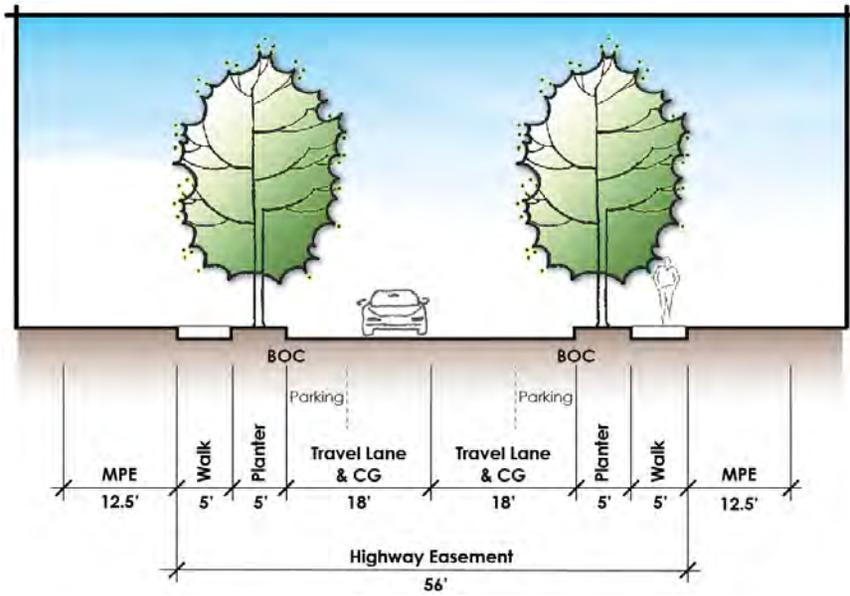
MINOR RESIDENTIAL STREET (WITH DETACHED SIDEWALK)
